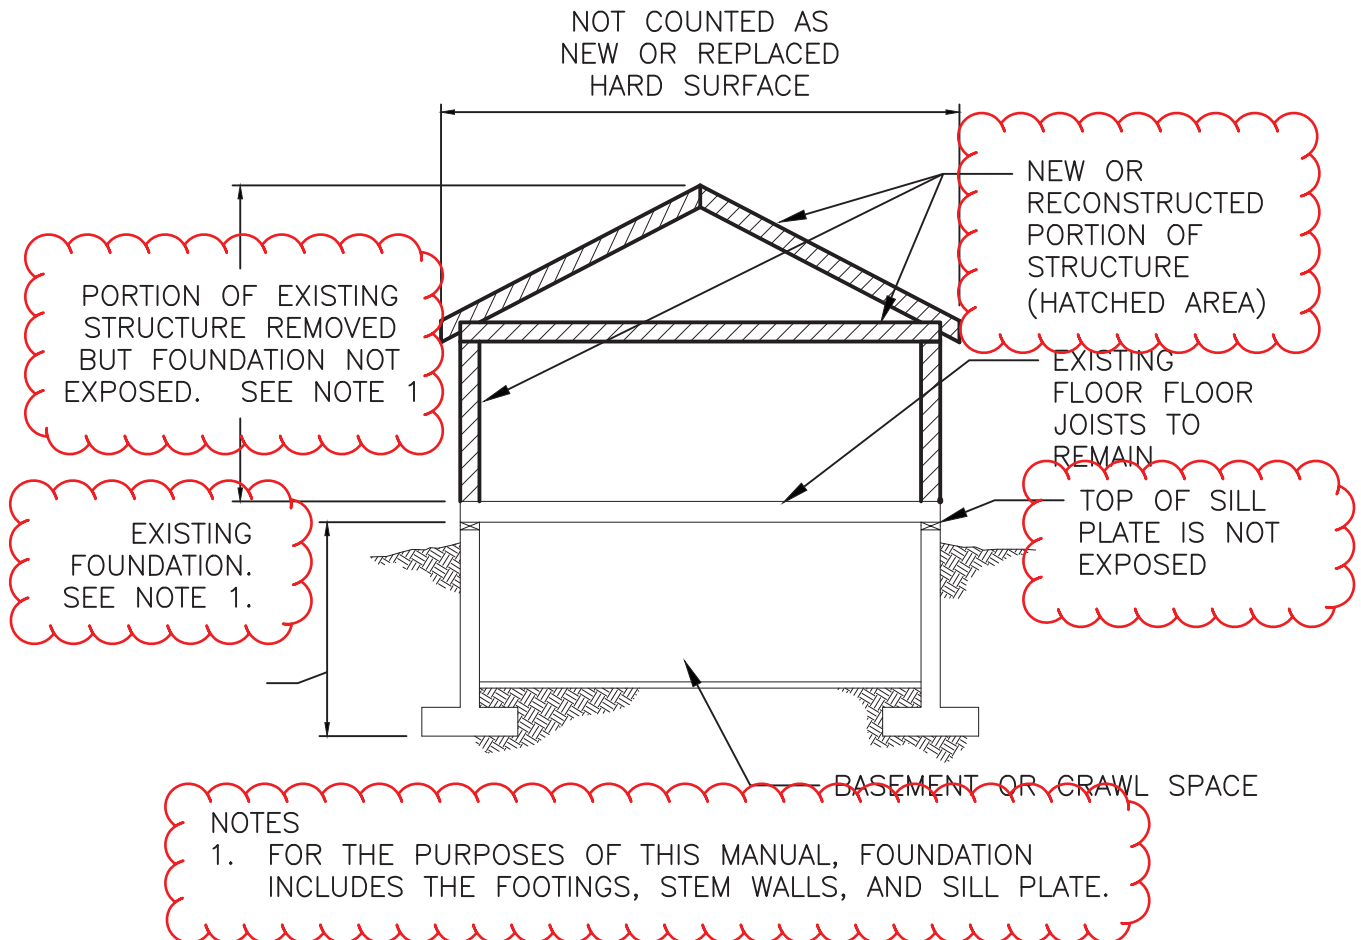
EXAMPLE OF EXISTING HARD SURFACE TO REMAIN WITH EXISTING FLOOR JOISTS TO REMAIN
